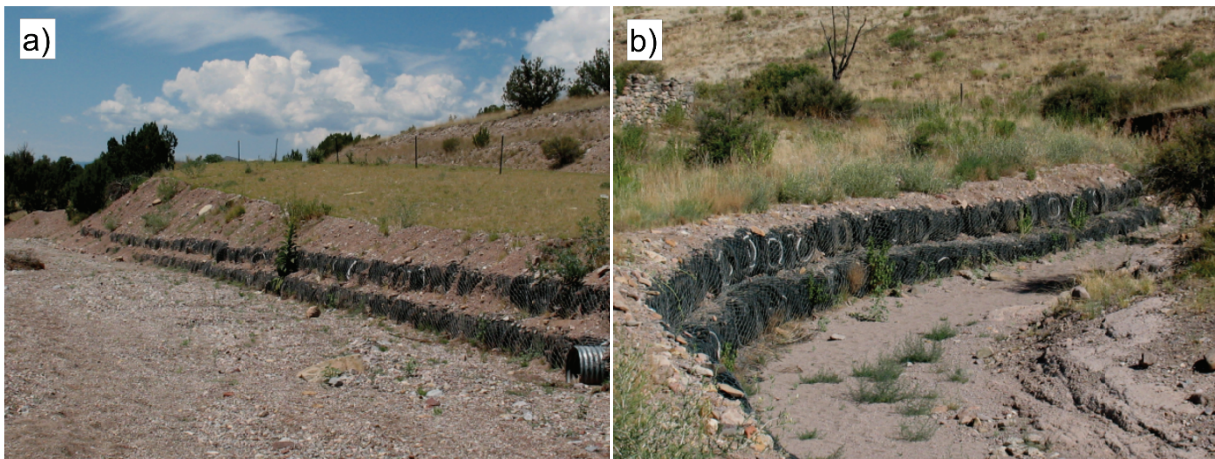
Tyre bale gravity walls constructed in a) Winston and b) Hillsboro, New Mexico, USA [19]
